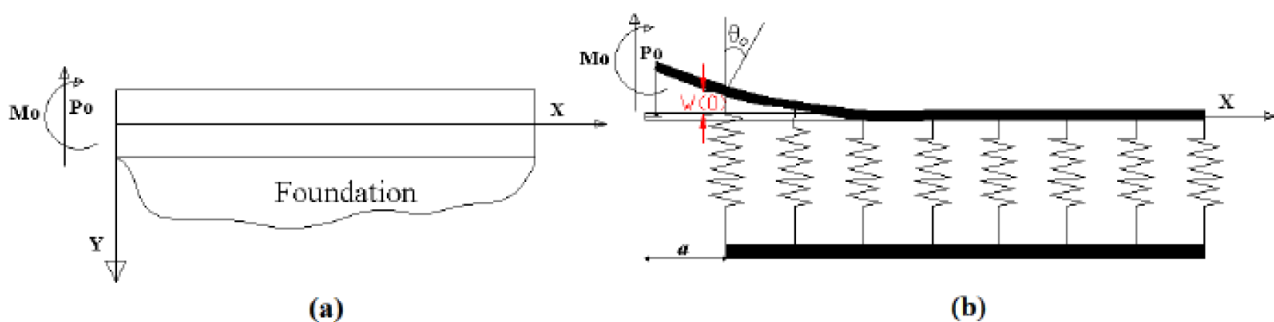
Model of beam on elastic foundation: (a) beam on elastic foundation, (b) schematization of a beam on springs as elastic foundation, [7].
